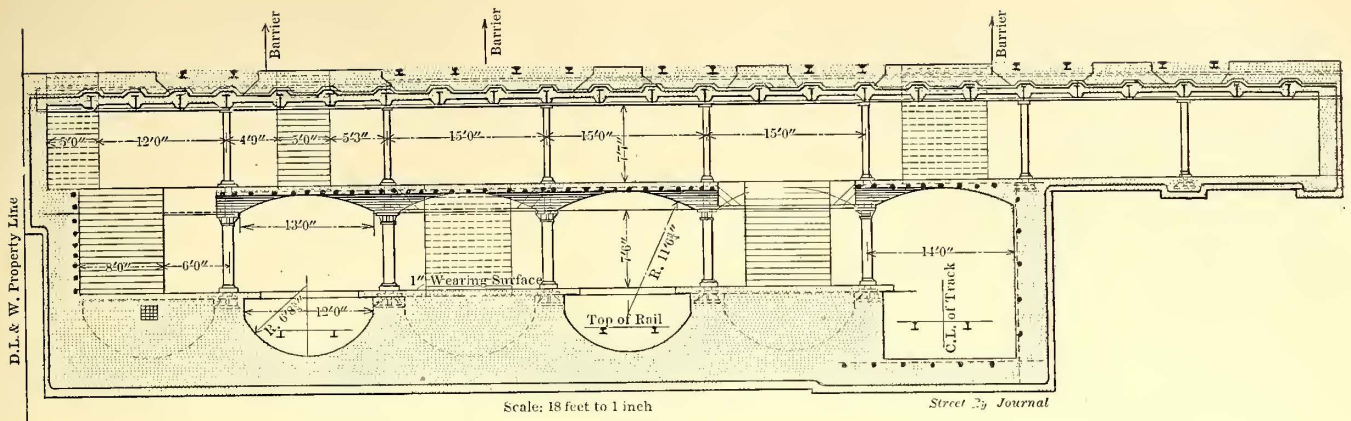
CROSS SECTION AT HOBOKEN TERMINAL
